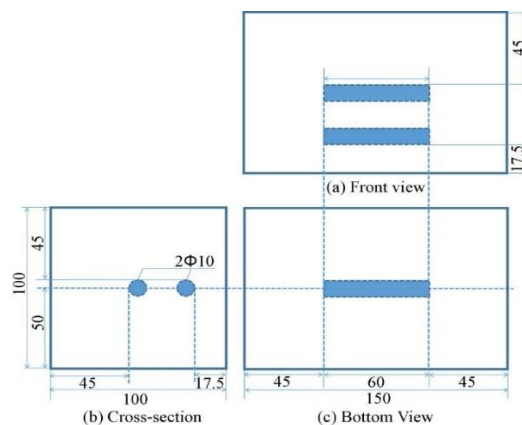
Dimensions, rebar arrangement and cross-section of test piece (in mm).
